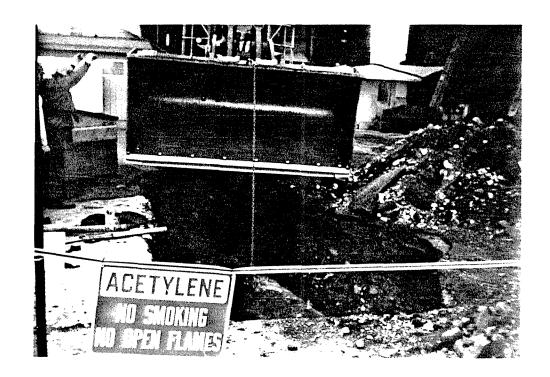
View looking at 11/27/89 tank excavation prior to tank removal
